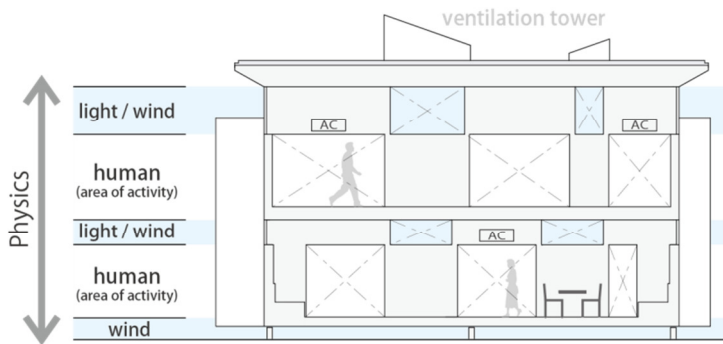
Multi layered sectioning (left), Photo.4 Floor inlets of engawa
